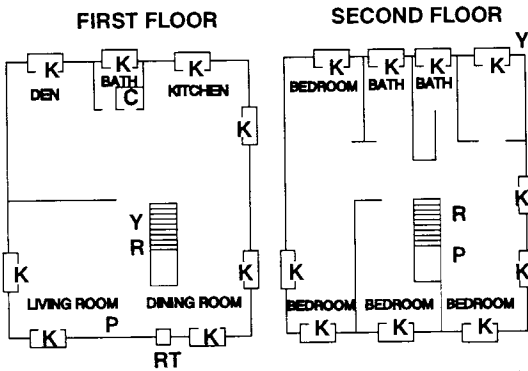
on page 1-2 details typical fire and burglar installation layouts. This can be used as a guide in planning the specific installation.
